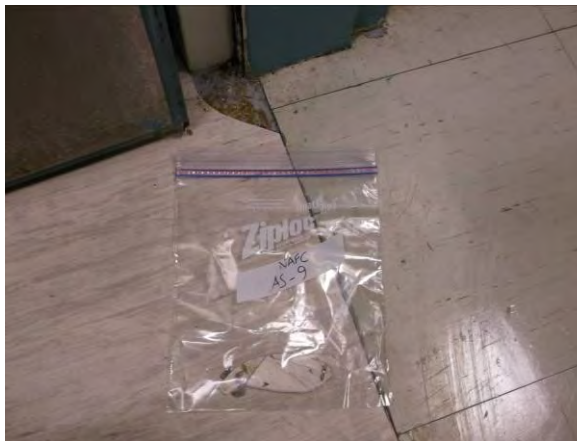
View of vinyl floor tile and mastic sample AS-09.
